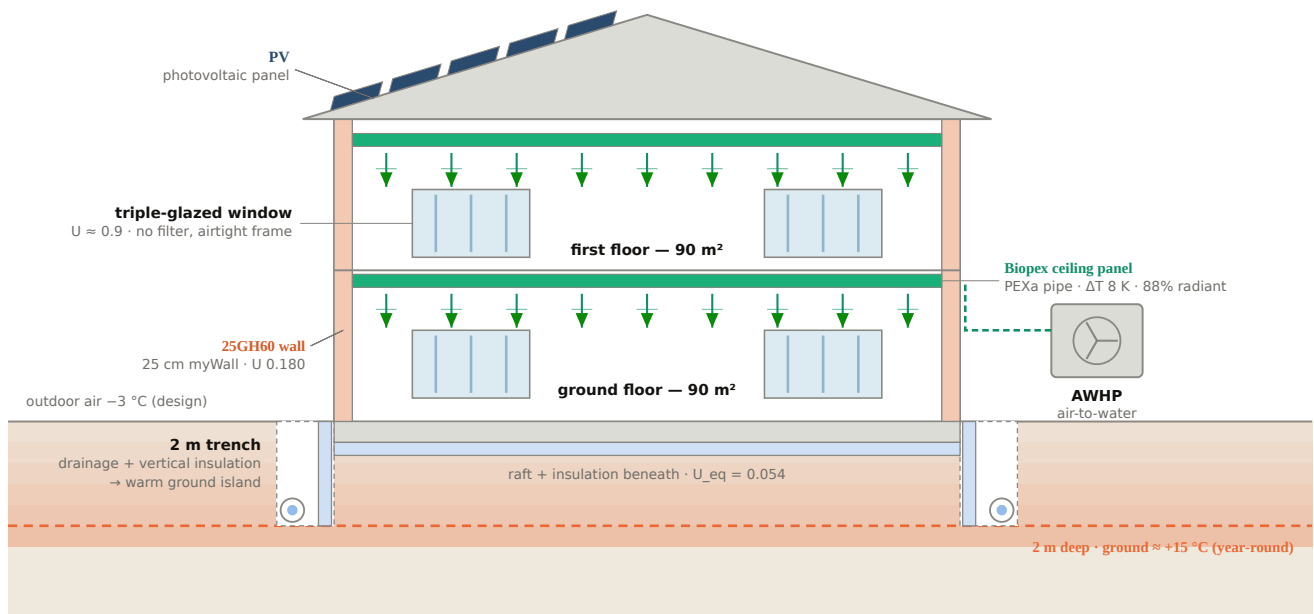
The Bioiklim villa: PV on the roof, AWWP outside, Biopex panels at the ceilings of both storeys, the 25GH60 wall in the envelope, and a 2 m drainage and insulation trench on all four sides.
